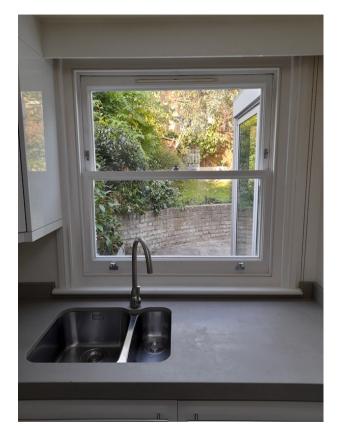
The small existing kitchen window provides limited views and connection to the rear garden.
